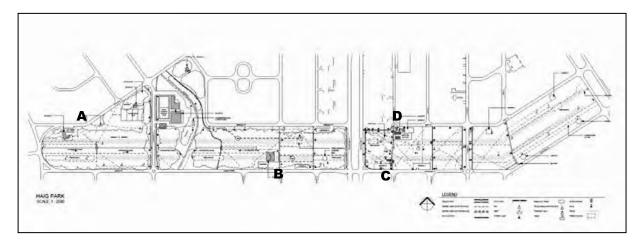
Haig Park showing location of buildings (Source: EMA 2013)
